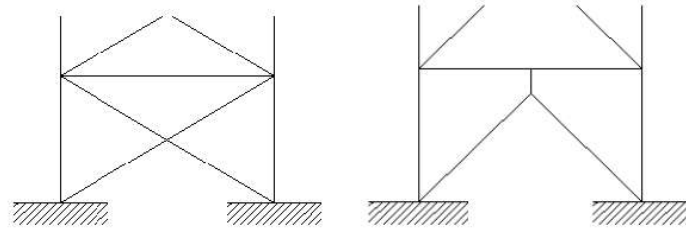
Concrete moment frame geometry with two types X shape centric brace and inverted Y shape eccentric brace
